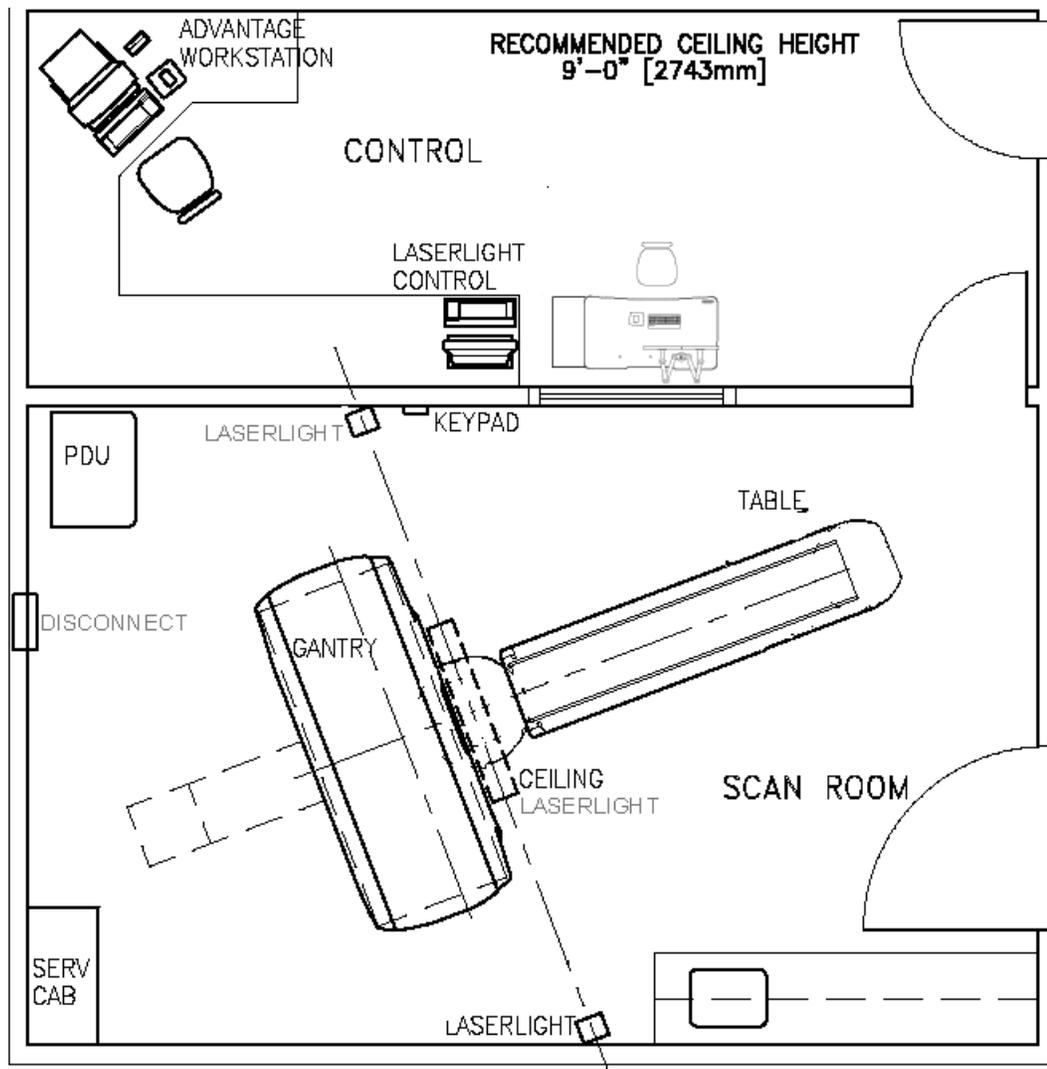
Typical Room Layout with CT Simulation Laser Alignment System
